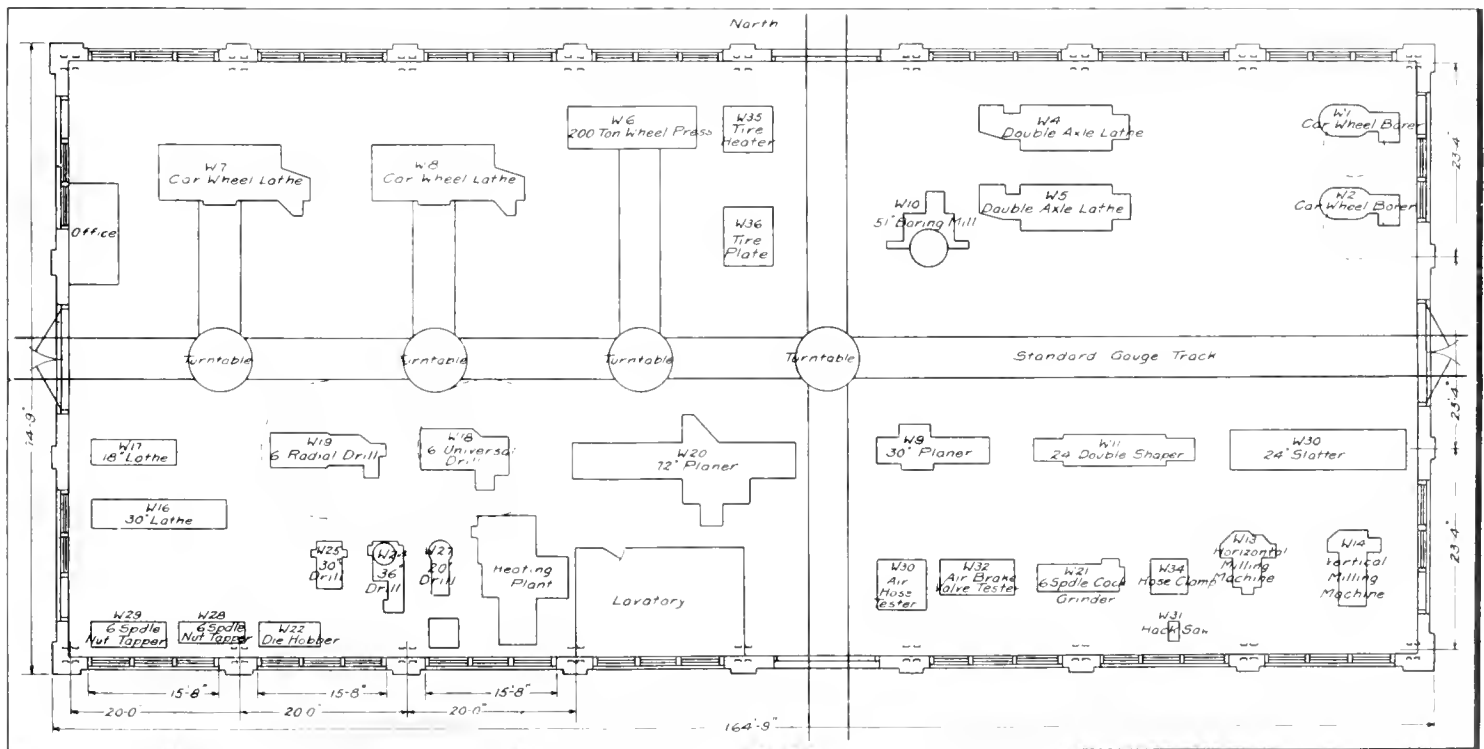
Plan and Machinery Location of Wheel and Machine Shop.
